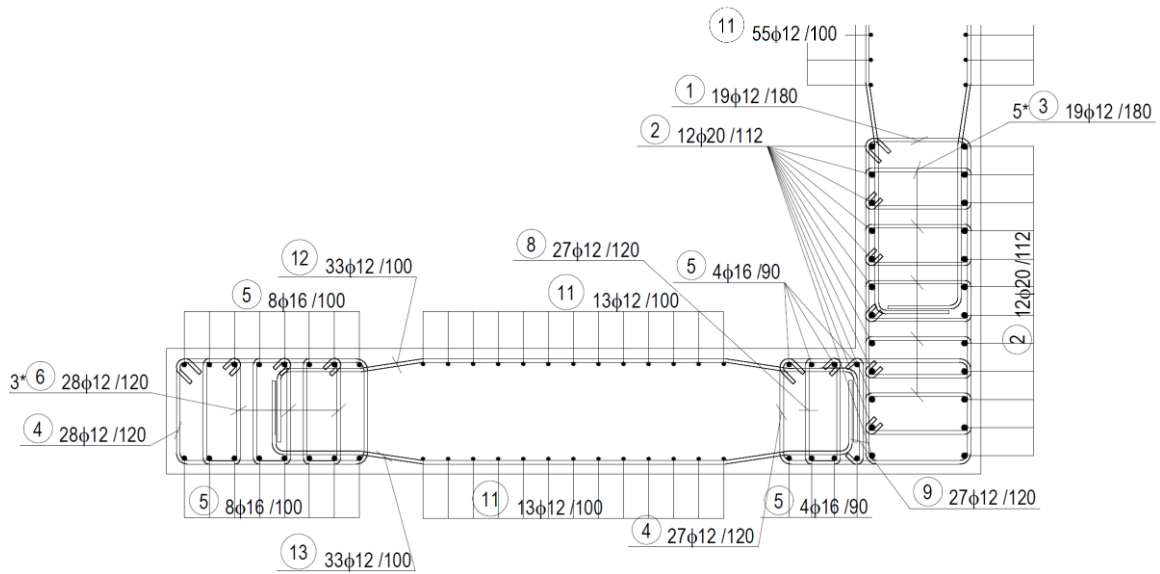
Reinforcement: boundary element and the crossing of two walls (DCM design, building height 50 m)
